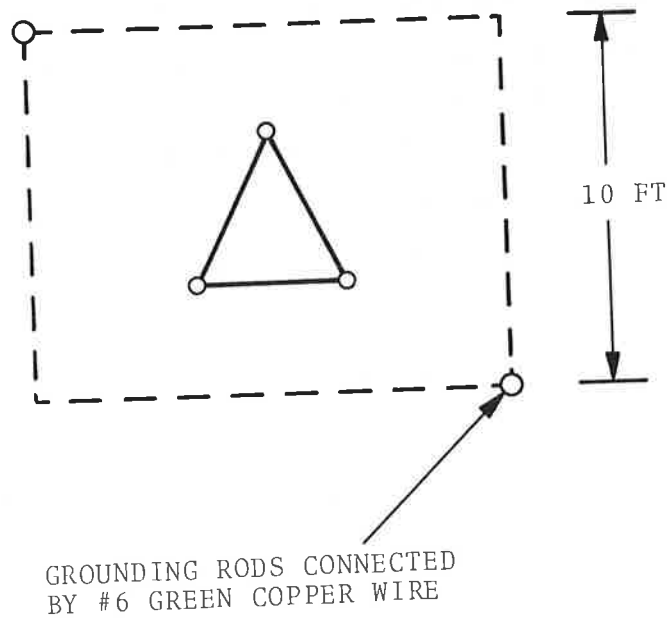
GROUNDING ROD INSTALLATION
